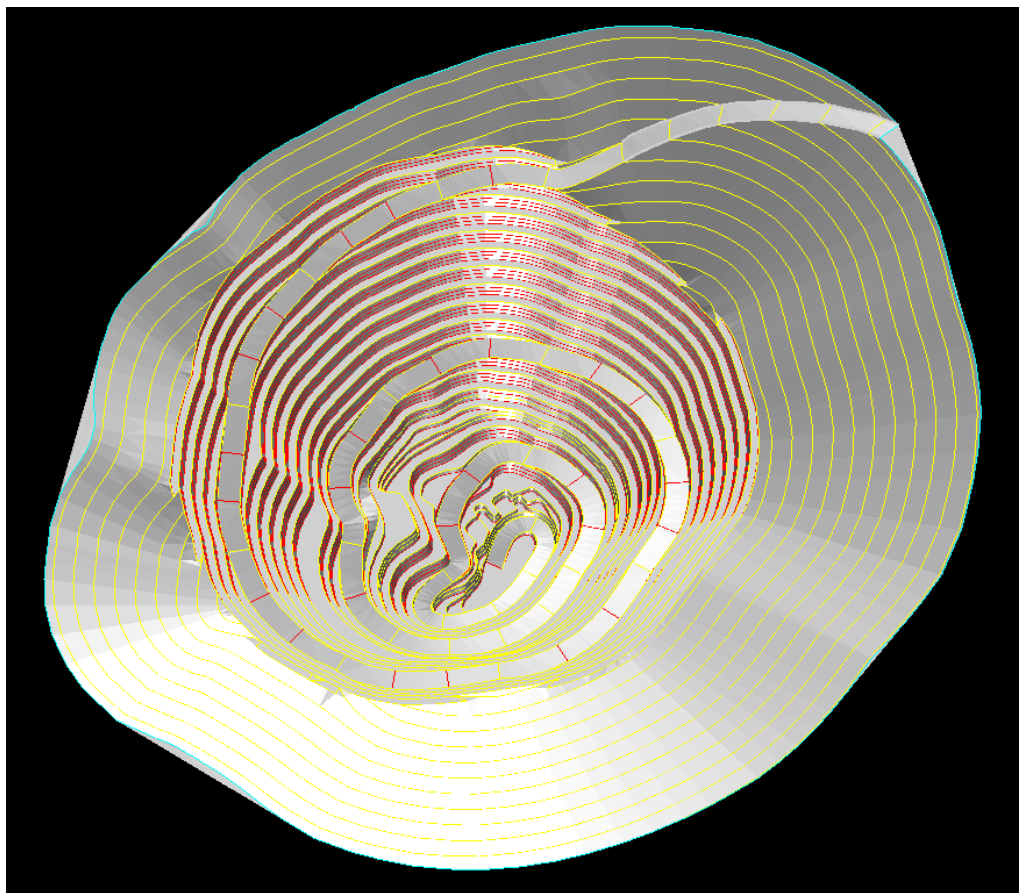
Isometric View of the 134 Pit Project (Ultimate Pit Shell)
